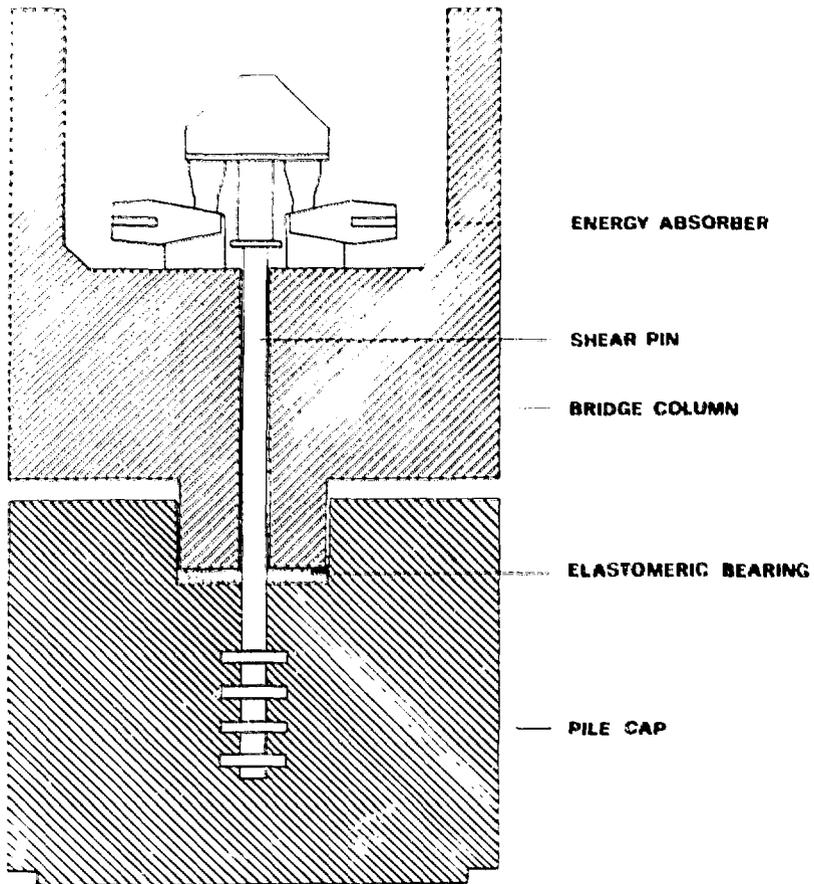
Detail of a Foot of the Piers of the South Rangitikei Bridge
